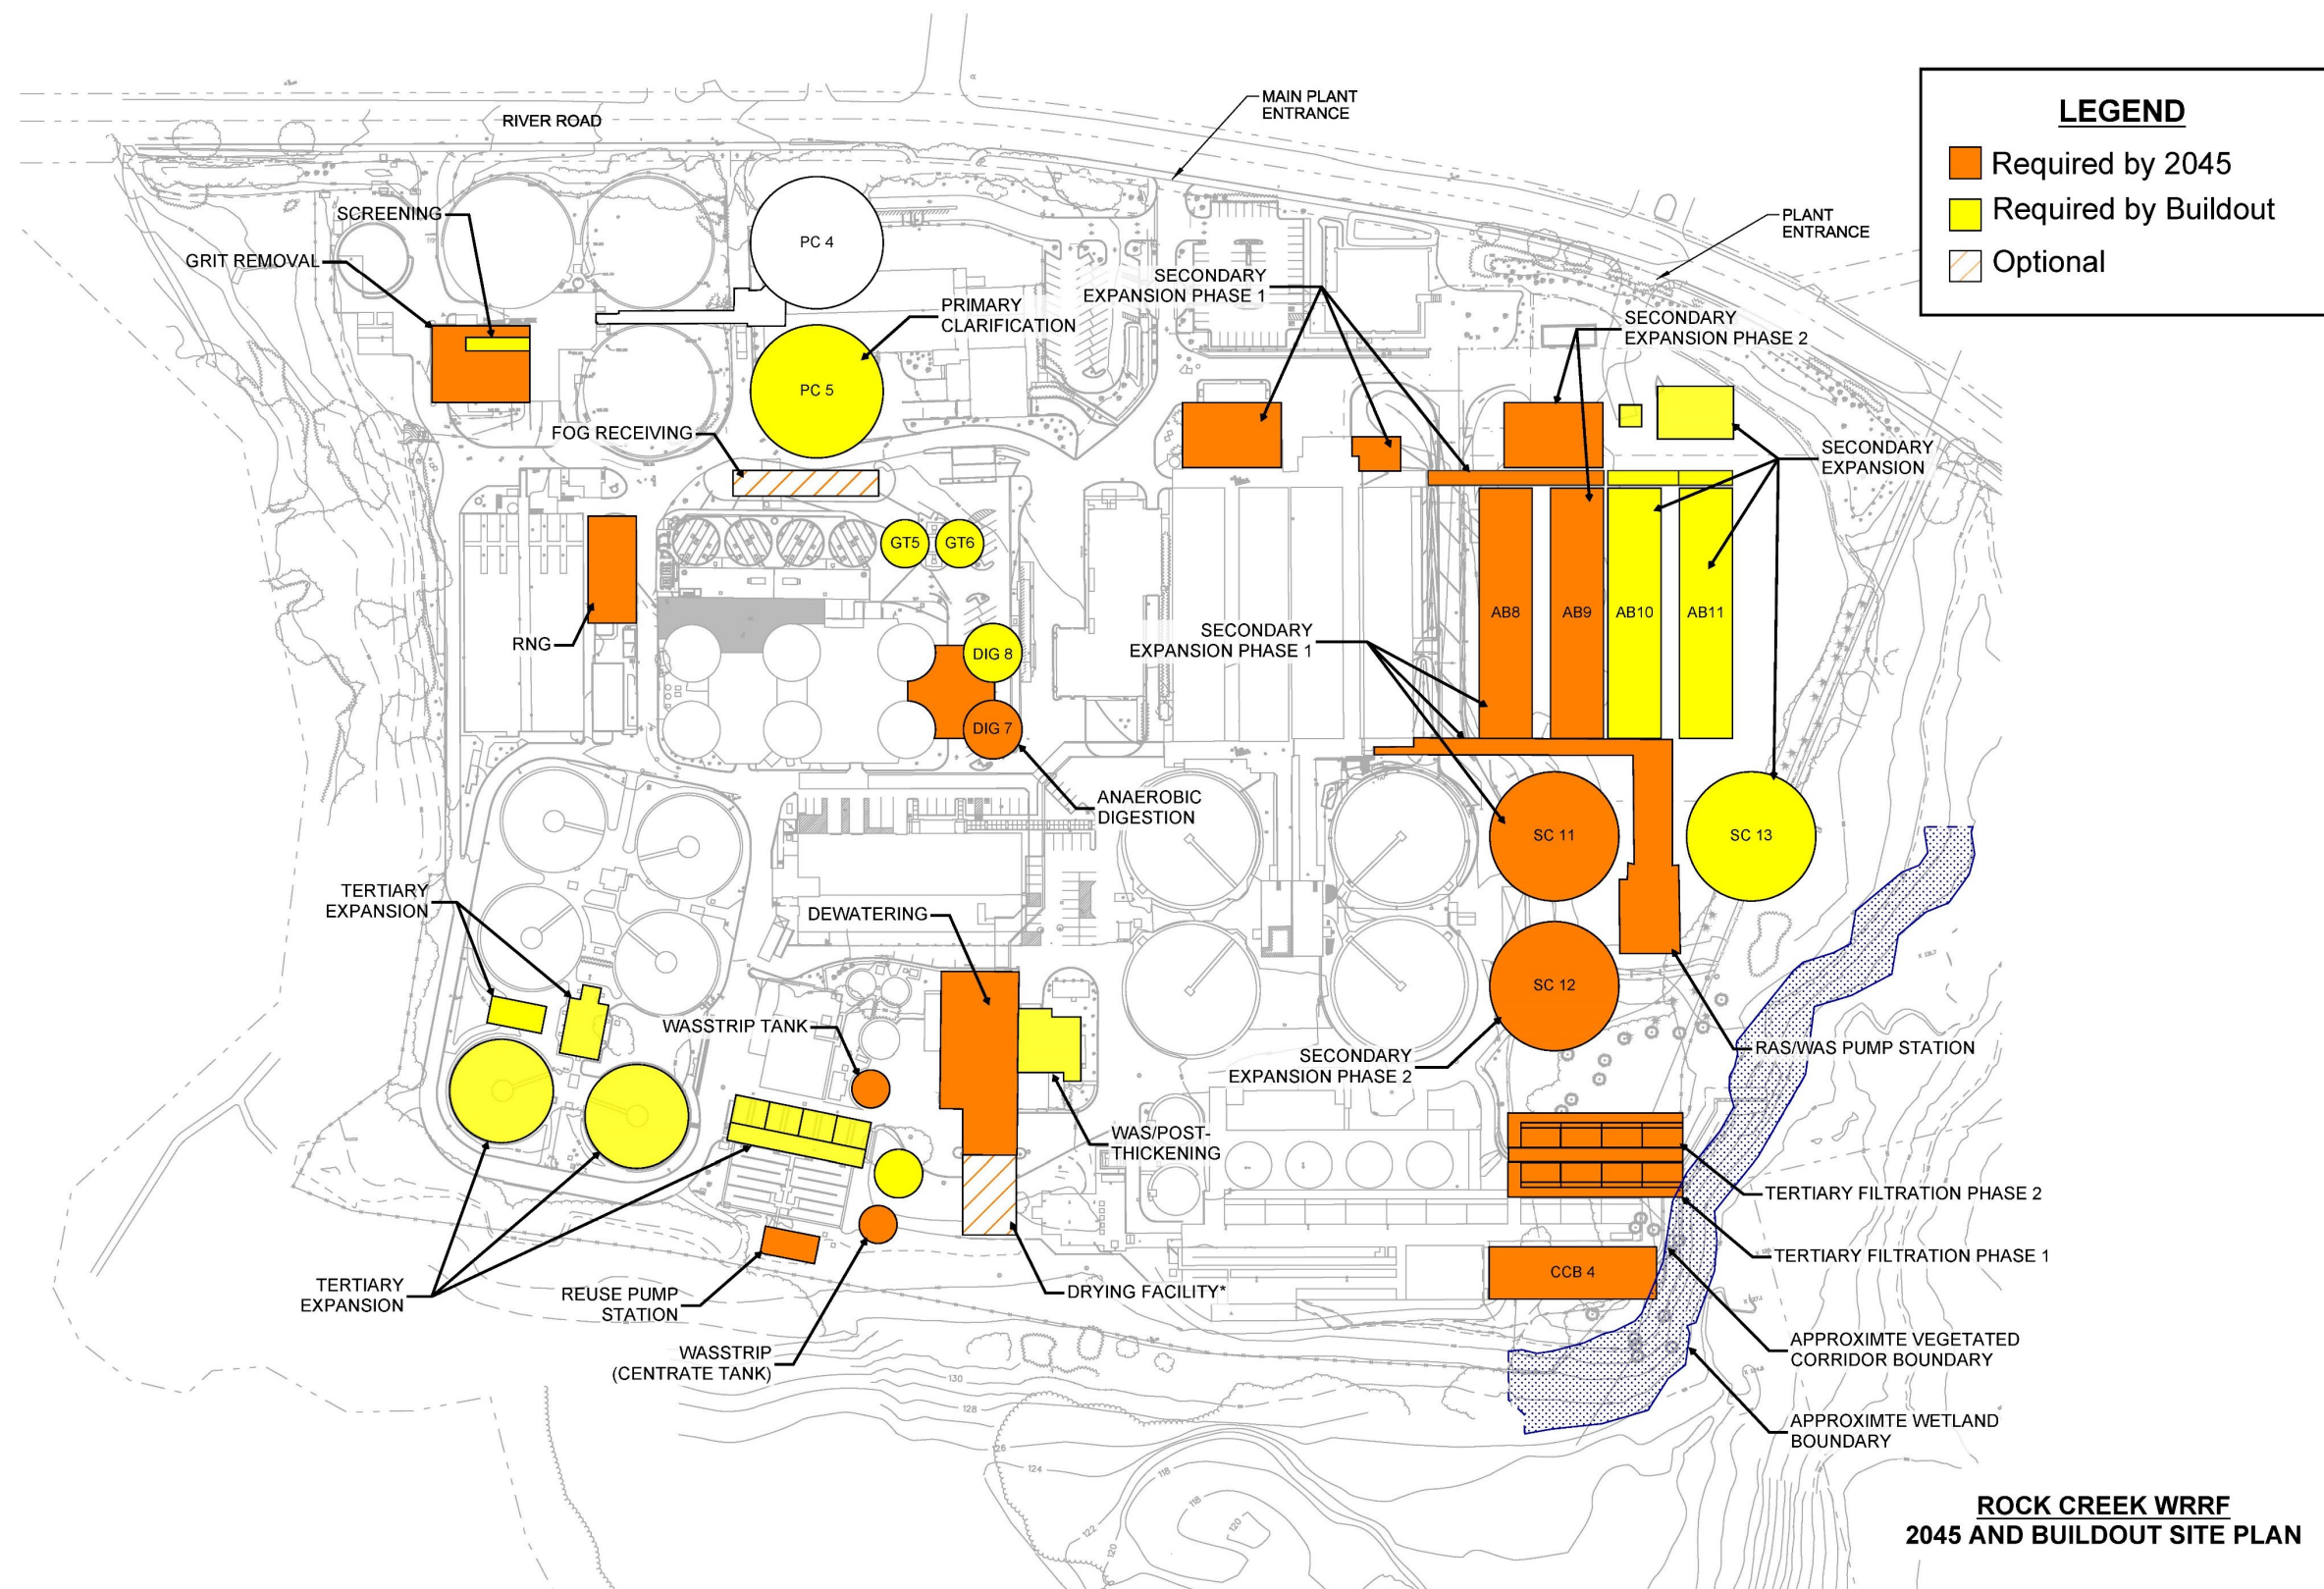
Rock Creek WRRF 2045 and Buildout Site Plan
